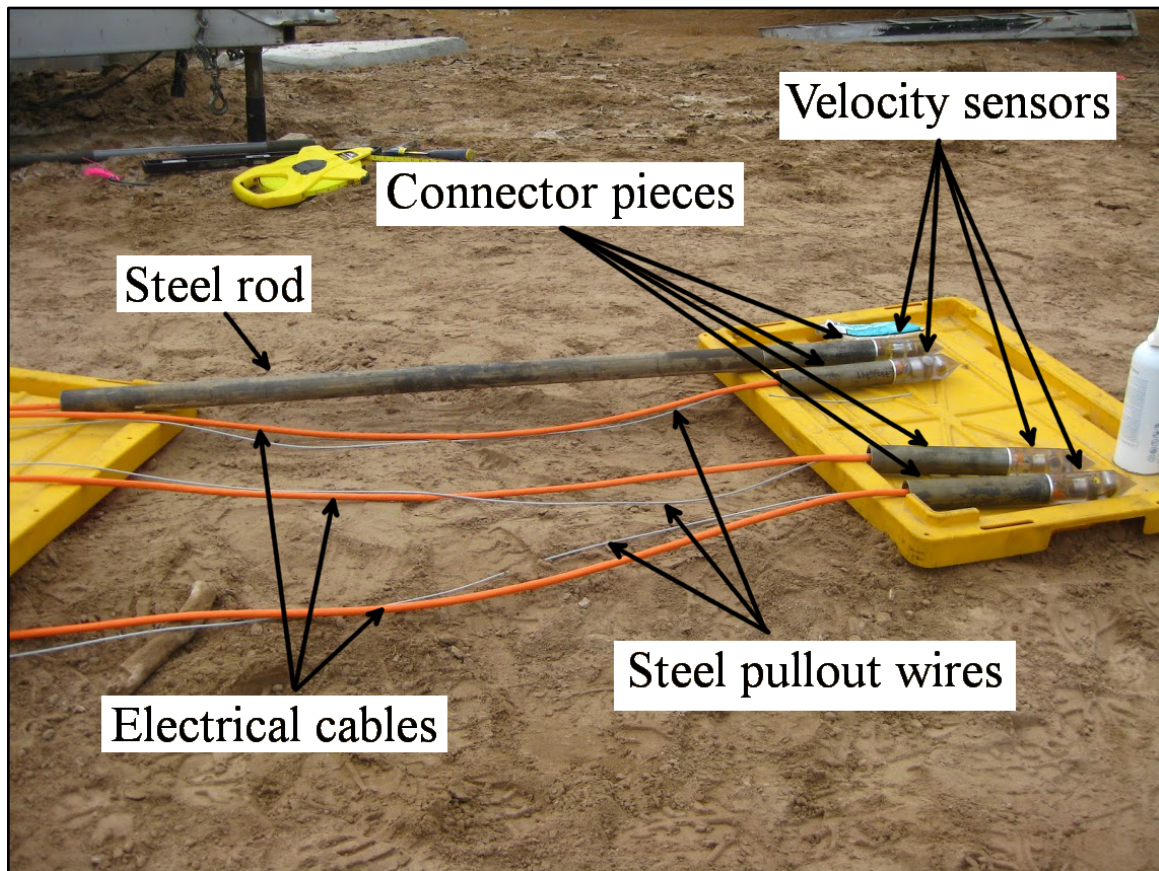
Photograph of 3-D velocity transducers being prepared for pushing. The 3-D velocity transducers, connector pieces, steel rods, electrical cables, and steel pullout wires are shown in the process of final assembly.
